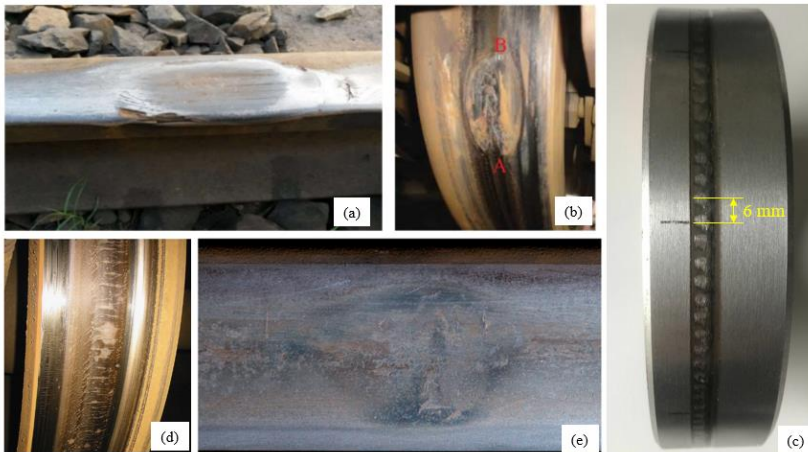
Typical wheel and rail damage caused by thermomechanical loading. (a) Rail burn [19]; (b) a wheel flat [20]; (c) polygonal wear; (d) thermal cracks on the wheel tread [21]; (e) thermal cracks in a squat [14].
